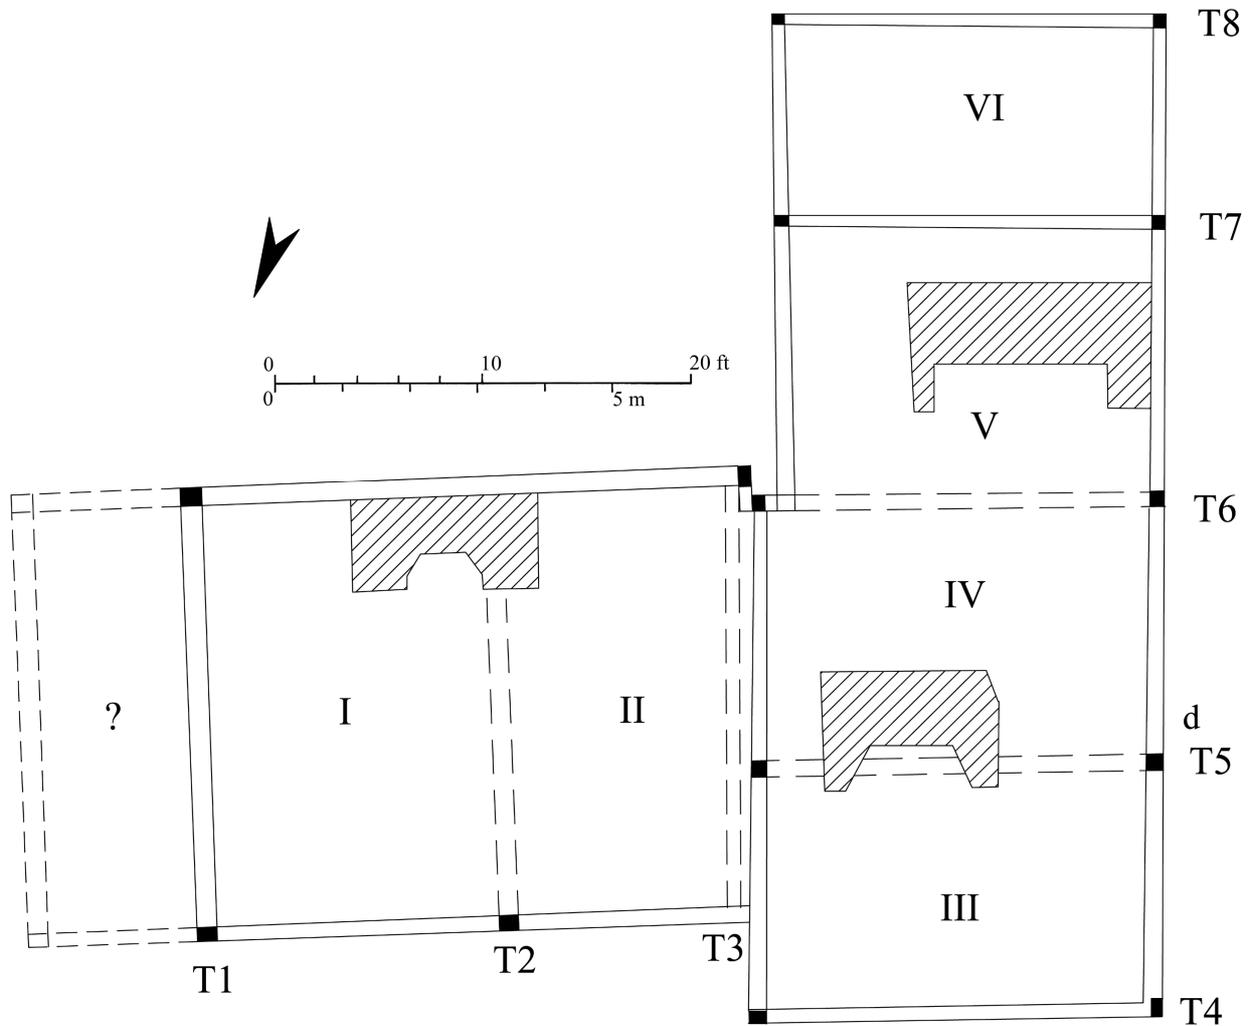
Ground floor plan of Tudor House: block plan with bay and truss numbering (positions of T7, T8 approximate);
